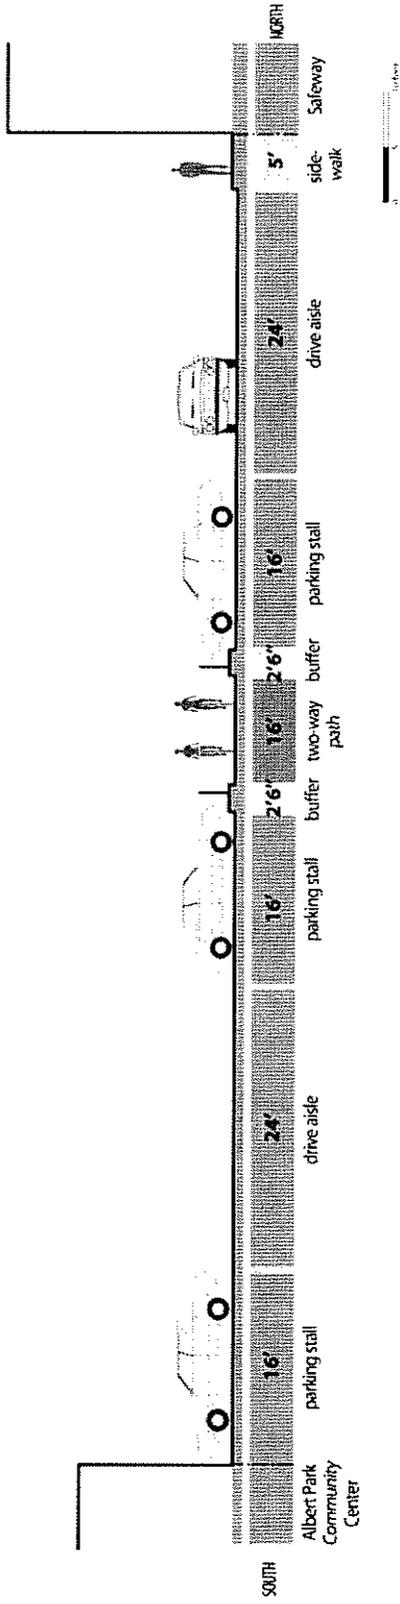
Section of Proposed Improvements for Project 14: First Street (B Street to Andersen Drive) (Medium-Term)
